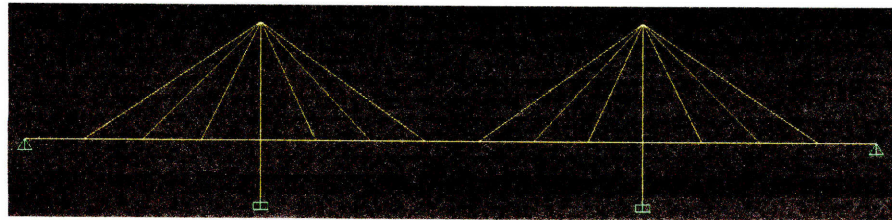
Fan-type cable arrangement in a cable-stayed bridge
